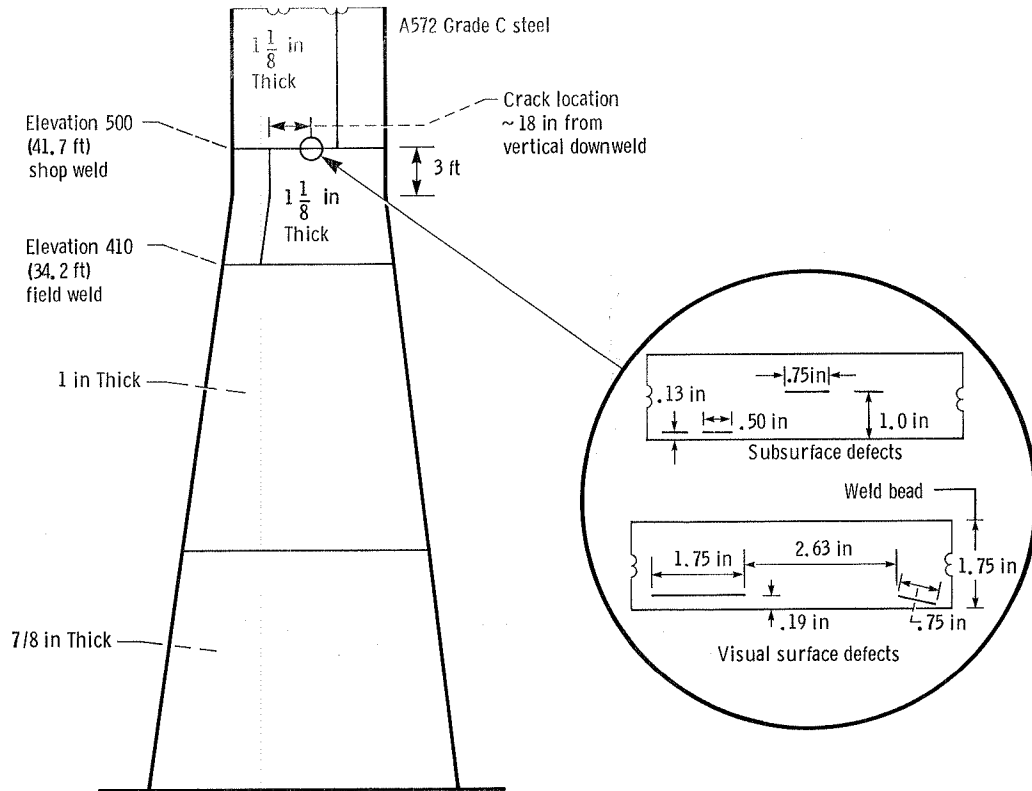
Solano (WT5) tower crack, view looking east. (Subsurface defects are directly below surface defects.)
